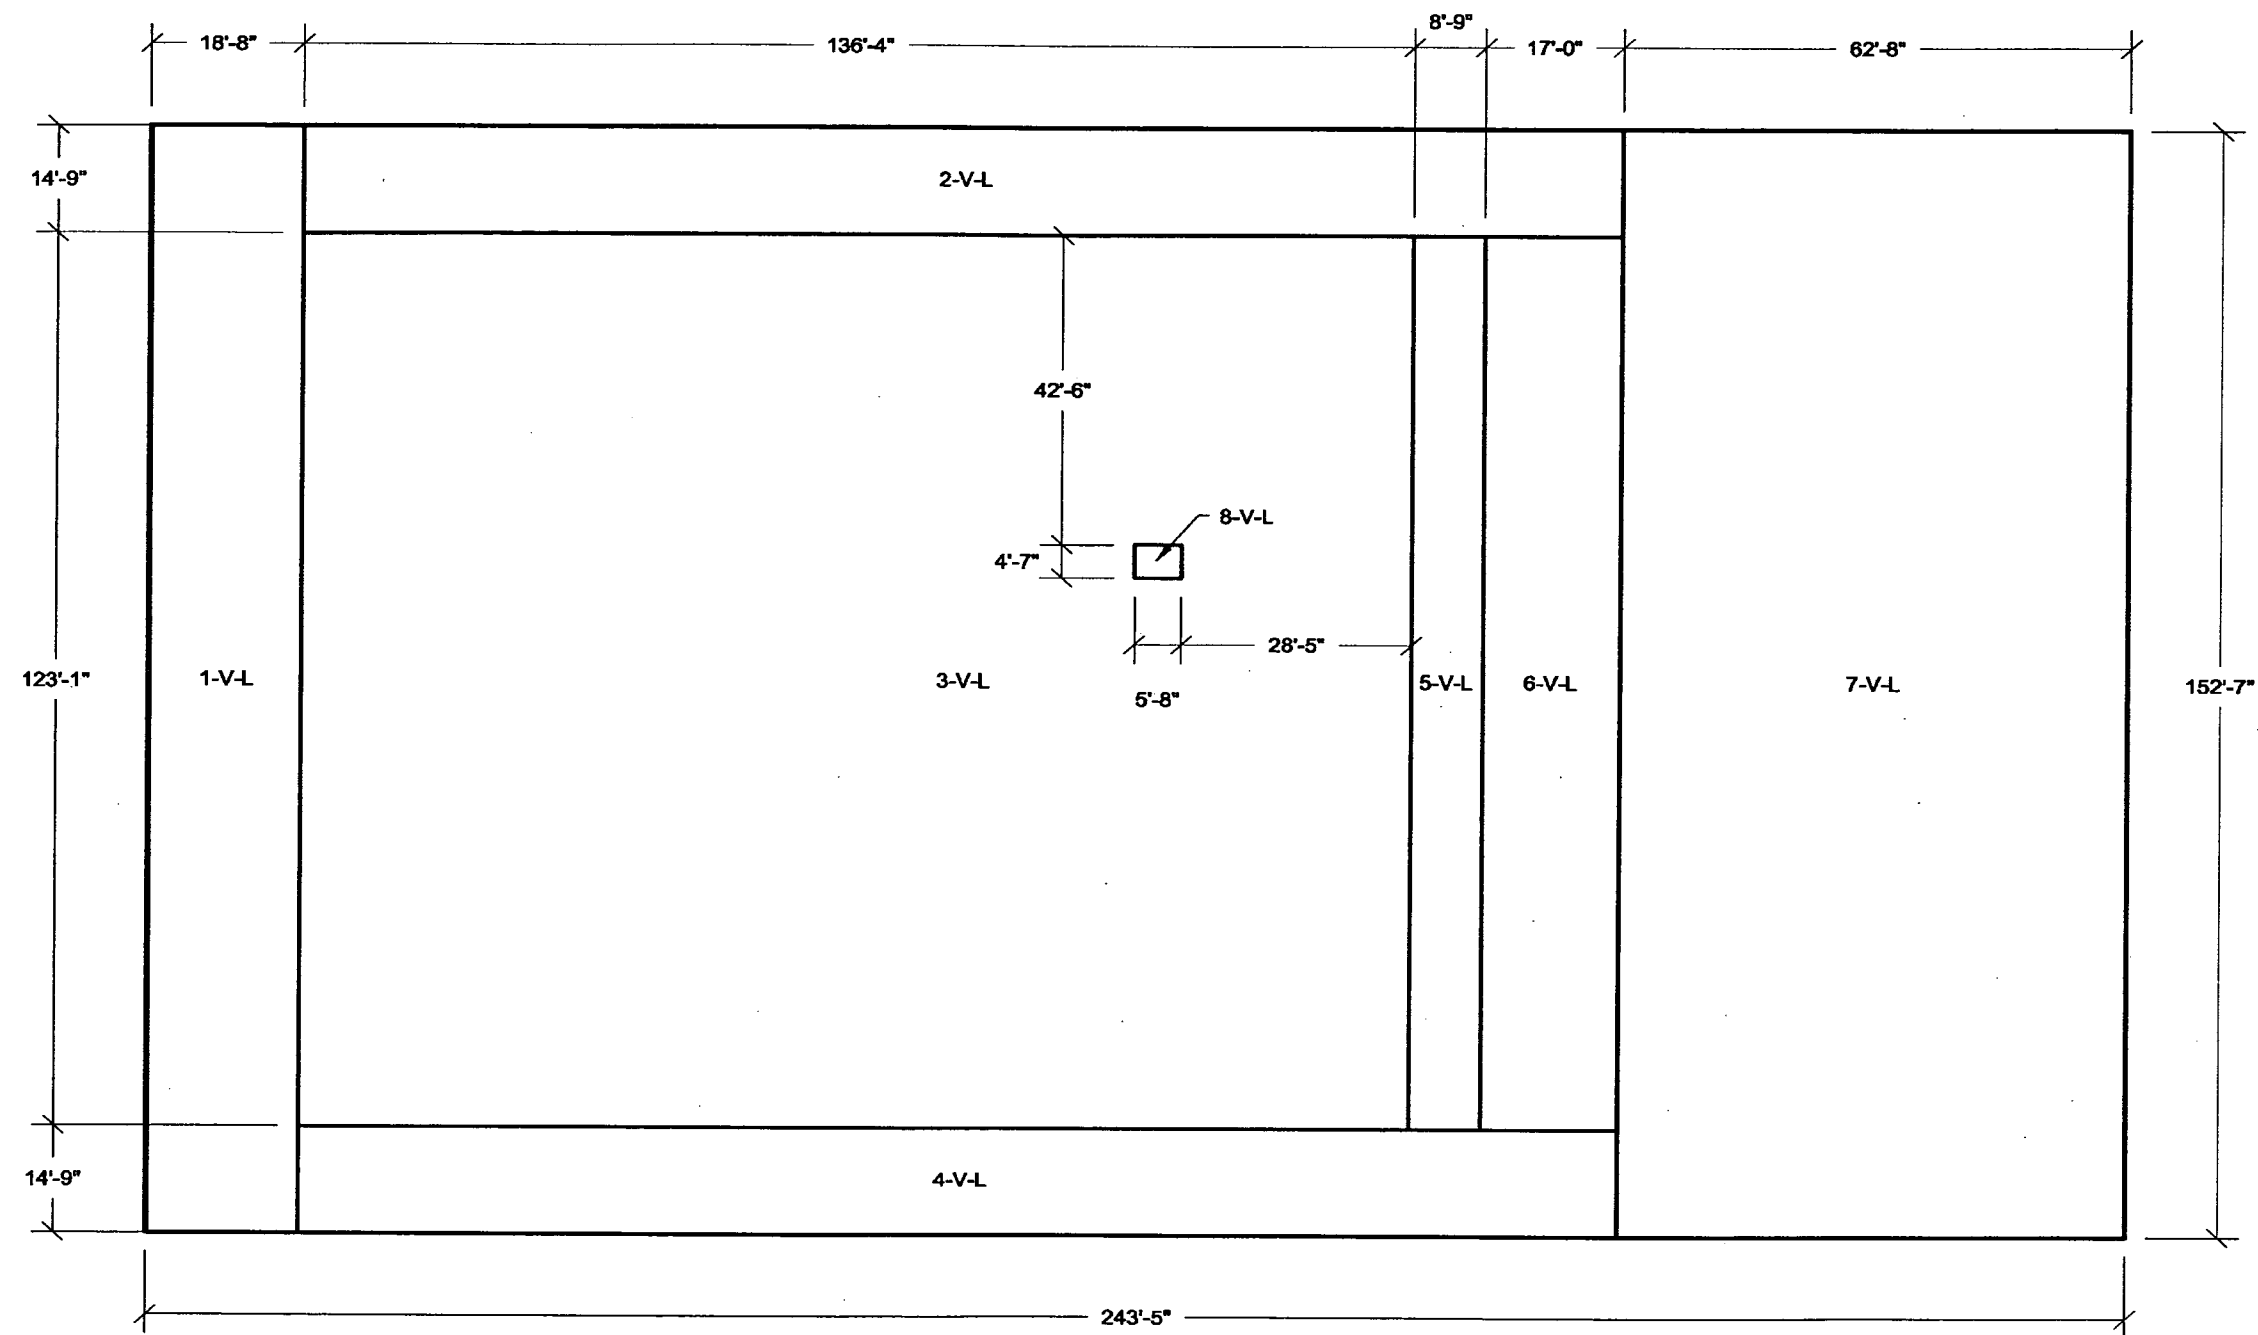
H.3-29: BASEMAT LOOKING DOWN
